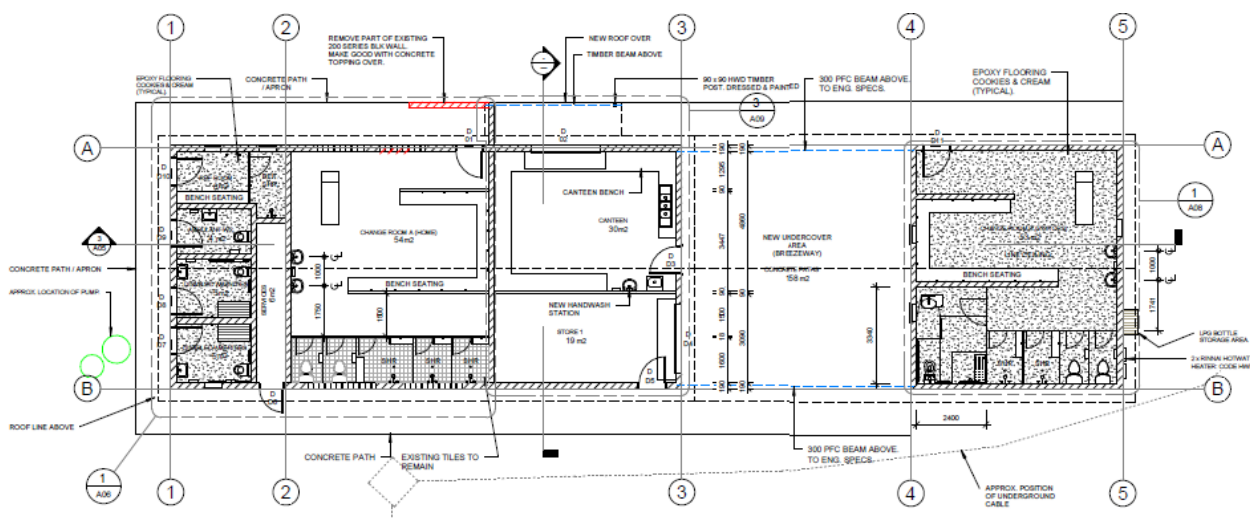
Floor Plan Option 2: Accessibility facilities to new change room
